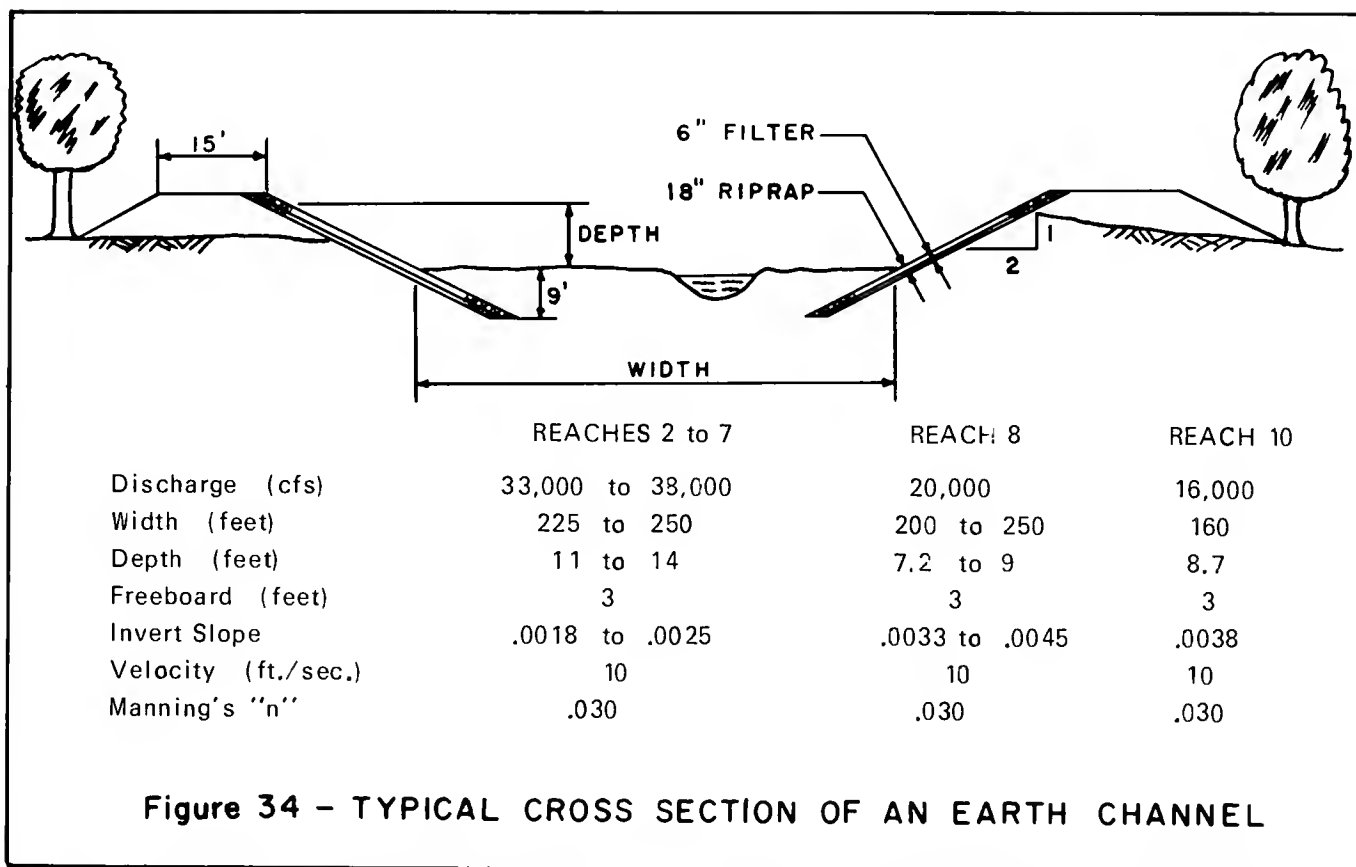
TYPICAL CROSS SECTION OF AN EARTH CHANNEL
